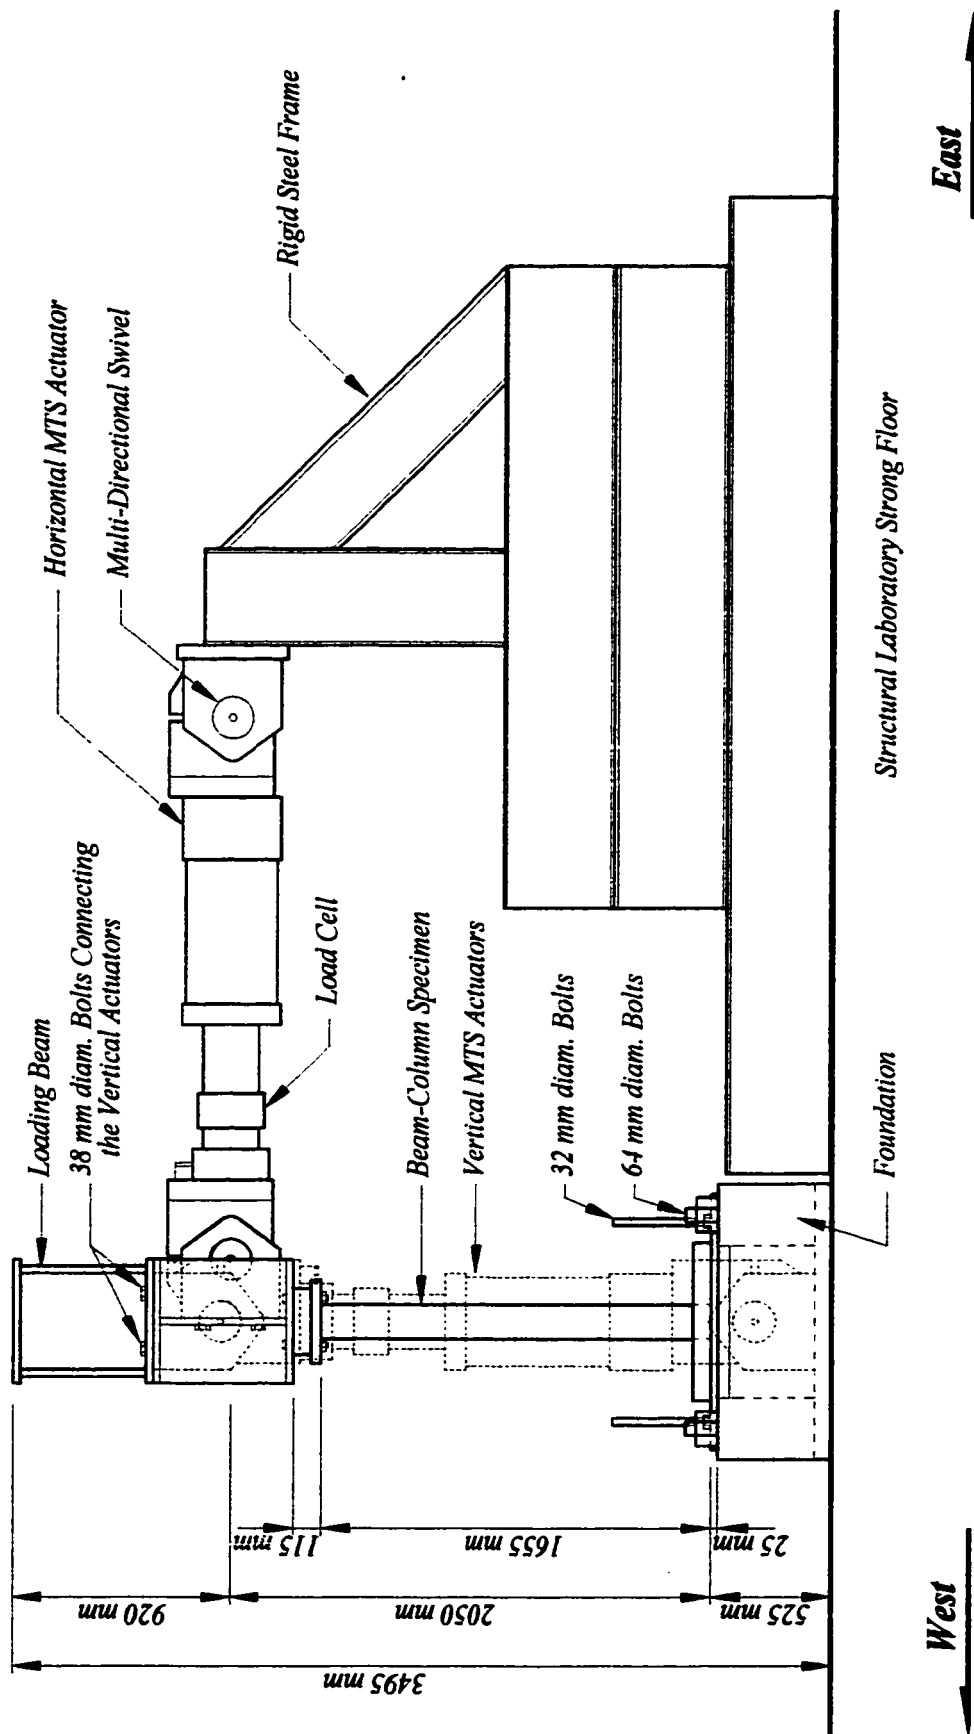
Test Setup for a Beam-Column Specimen
